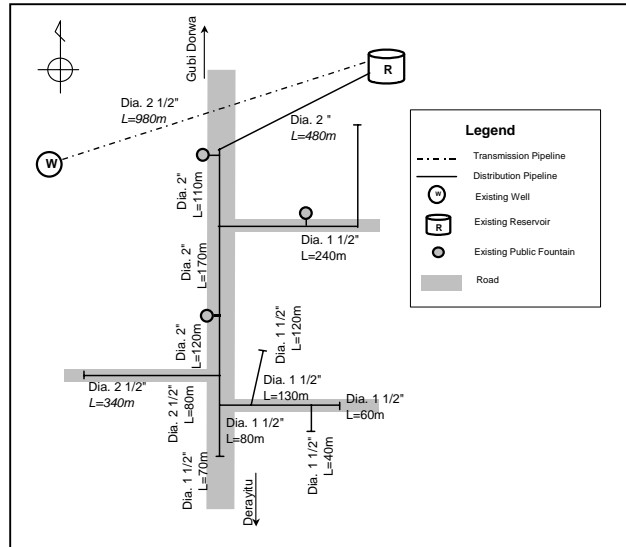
Layout of Existing Facilities of Kelewan
